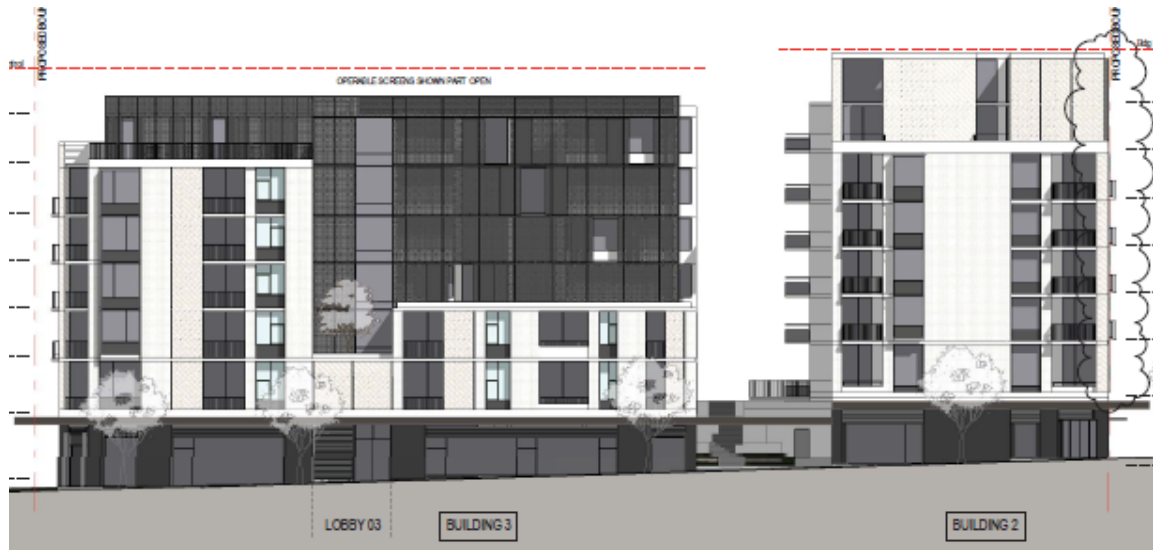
Gadigal Avenue elevation of Buildings 2 and 3
